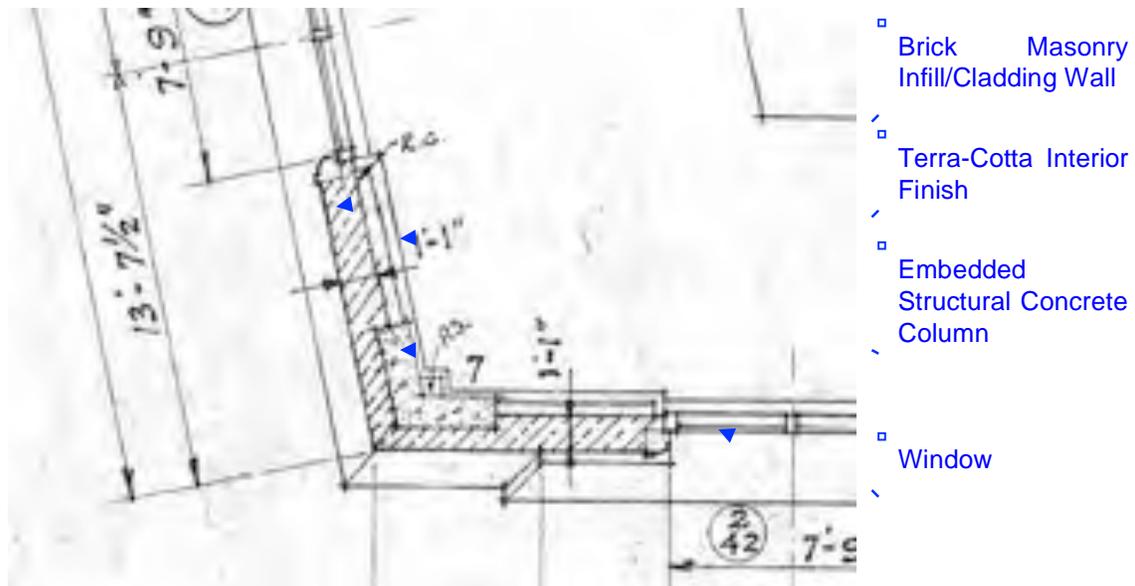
(1): Typical Exterior Wall Type, SW Corner, Level 2
